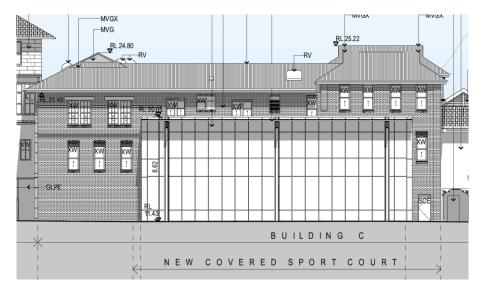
Extract from northern elevation, showing proposed contemporary addition to the north of Building C2
